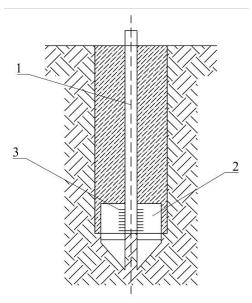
Bored pile after the borehole concreting 1 - barrel; 2 - pointed plates; 3 - welded joints
